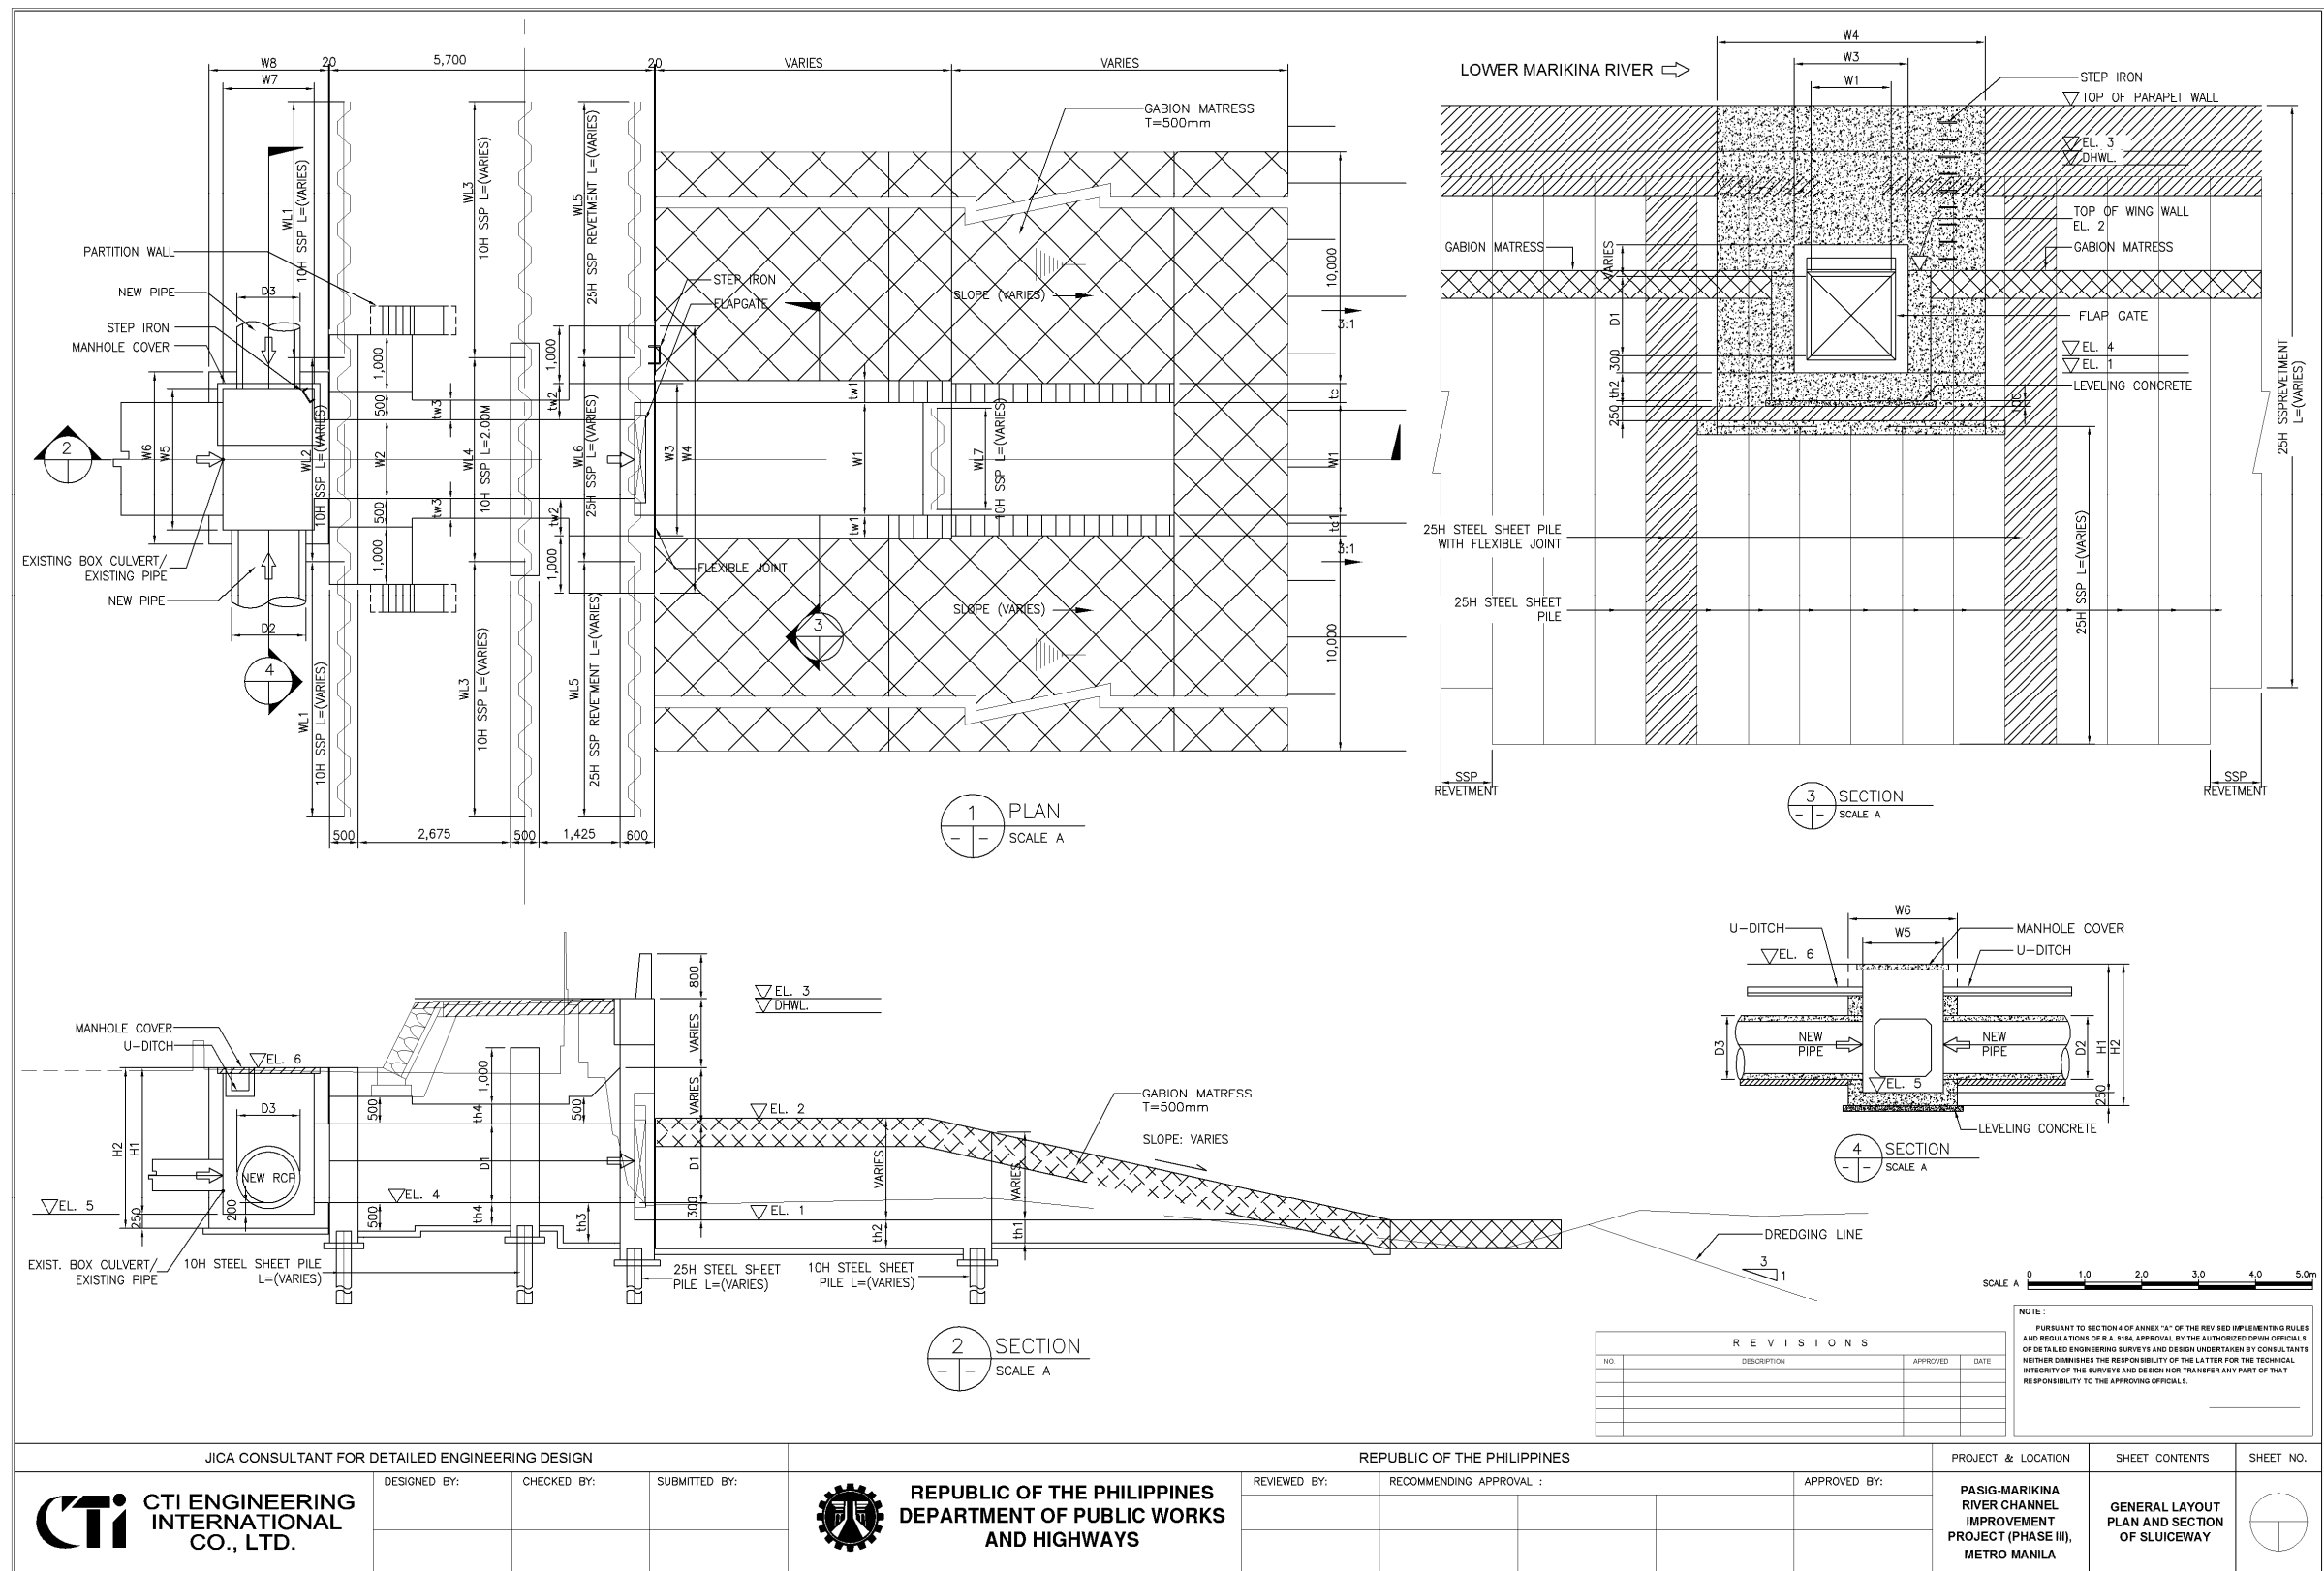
Typical Drawing of Sluiceway in Lower Marikina River
